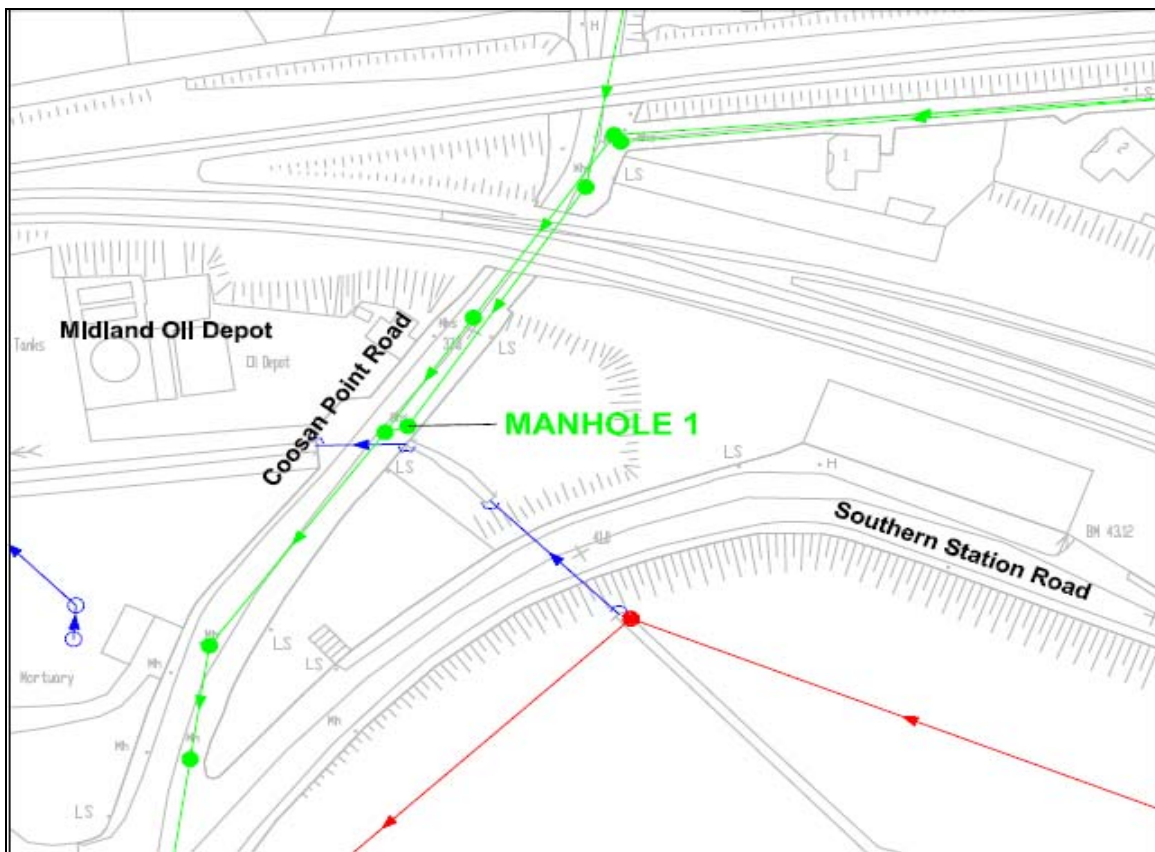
Manhole 1 on Coosan Point Road
